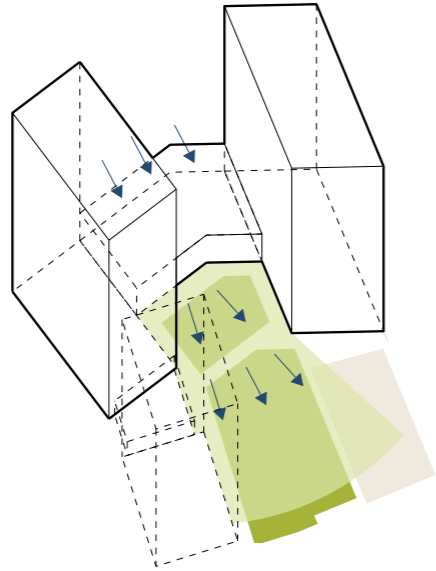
Buildings C1, C2 and the Community Centre connection with Madingley Gardens
